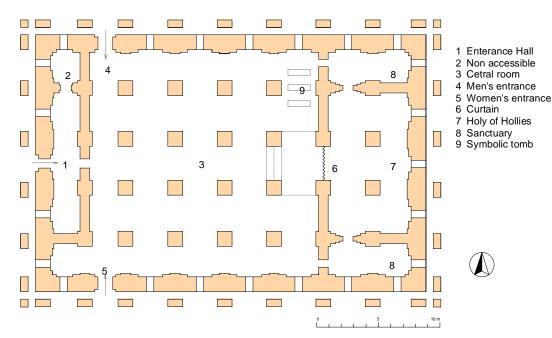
, floor plan of Bete Medhane Alem with its 5 aisles & 8 bays
